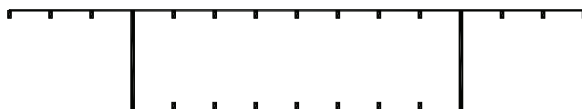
Typical cross-section of a box-girder with stiffened plates
